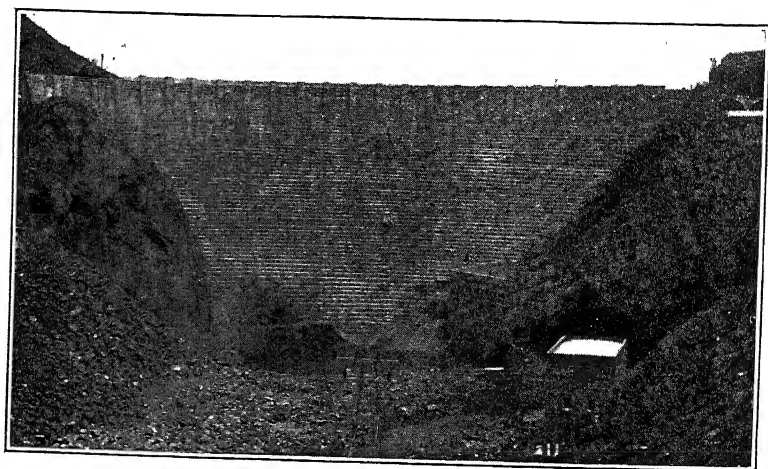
Roosevelt dam showing power house and transformer house in foreground.
